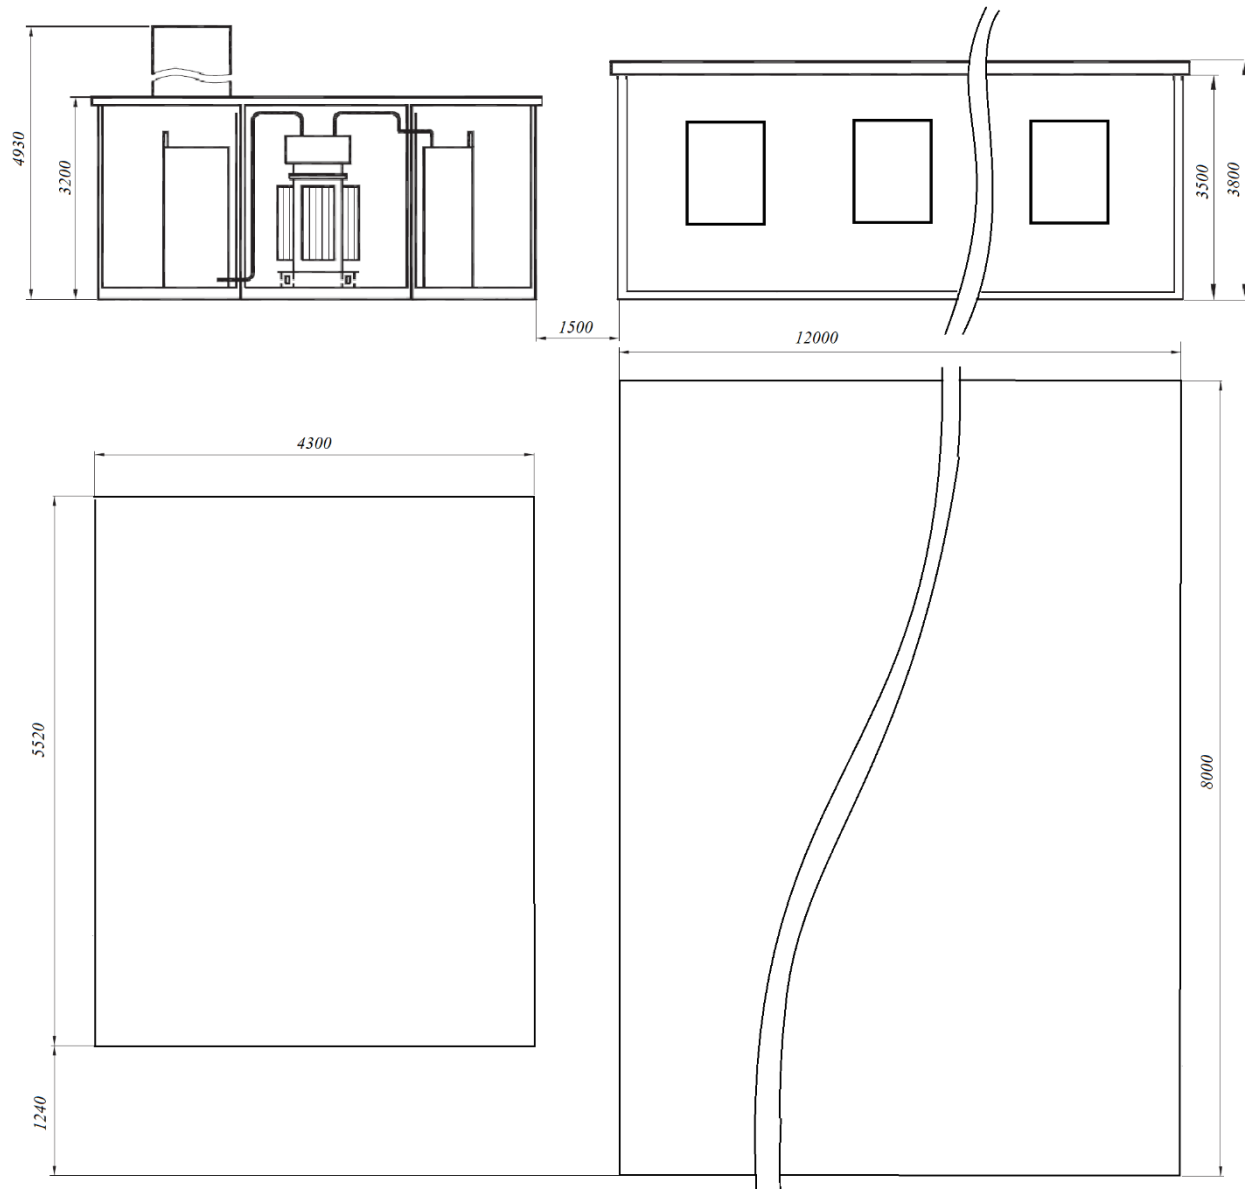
The layout and dimensions of standard indoor transformer substation and adjacent building
